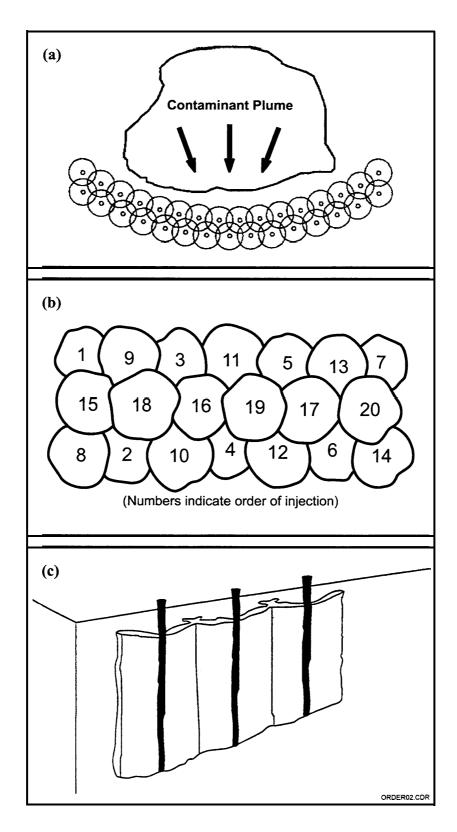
Diagram of (a) Plan View of a Grouted Impermeable Barrier (after Richardson, 1992), (b) Geometric Layout of Grouted Injection Holes (after Rumer and Ryan, 1995), and (c) Vertical Thin Diaphragm Walls (after Shoemaker et al., 1996)
